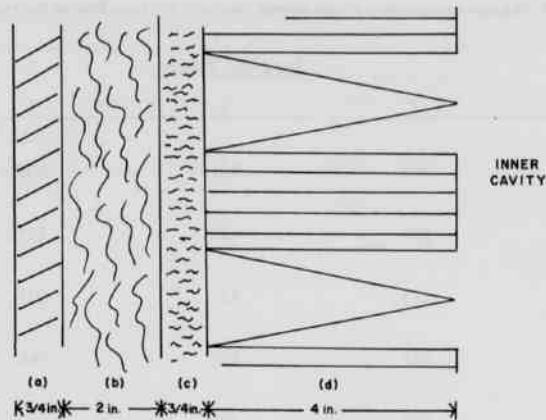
Cross section of the construction of a wall segment, (a)-plywood, (b)-rock wool insulation, (c)-acoustical ceiling tile, (d)-foam wedges.
